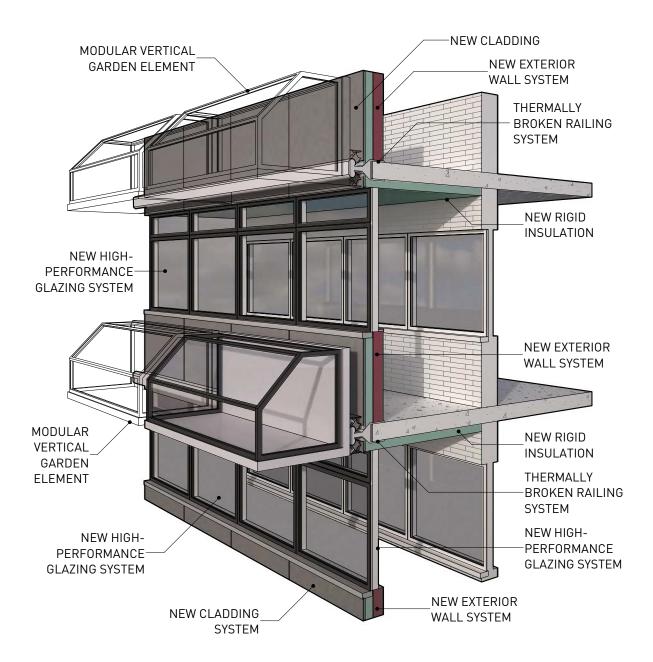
Proposed Intervention for Modular Vertical Greenhouse
